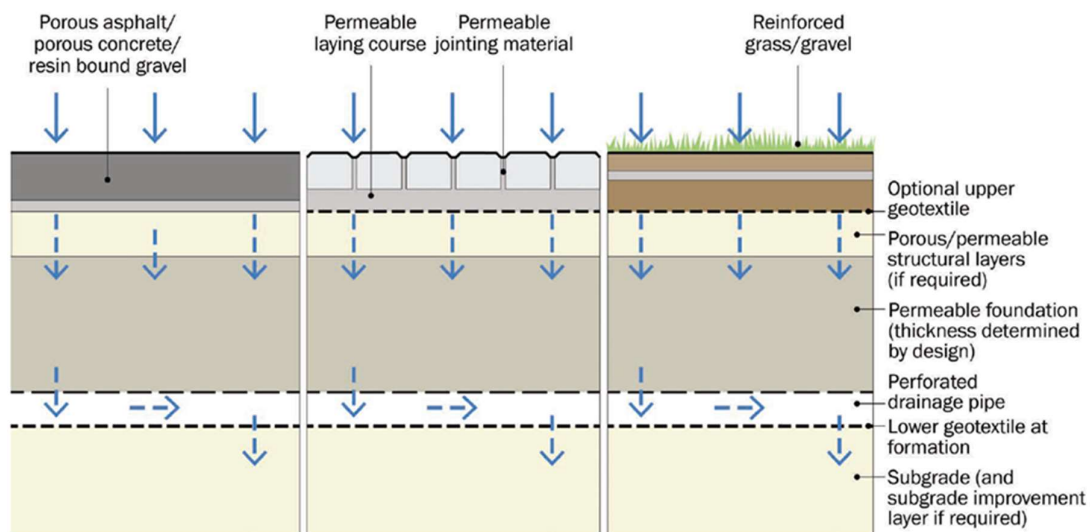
Detail of Type B Pervious Paving (CIRIA C753)
